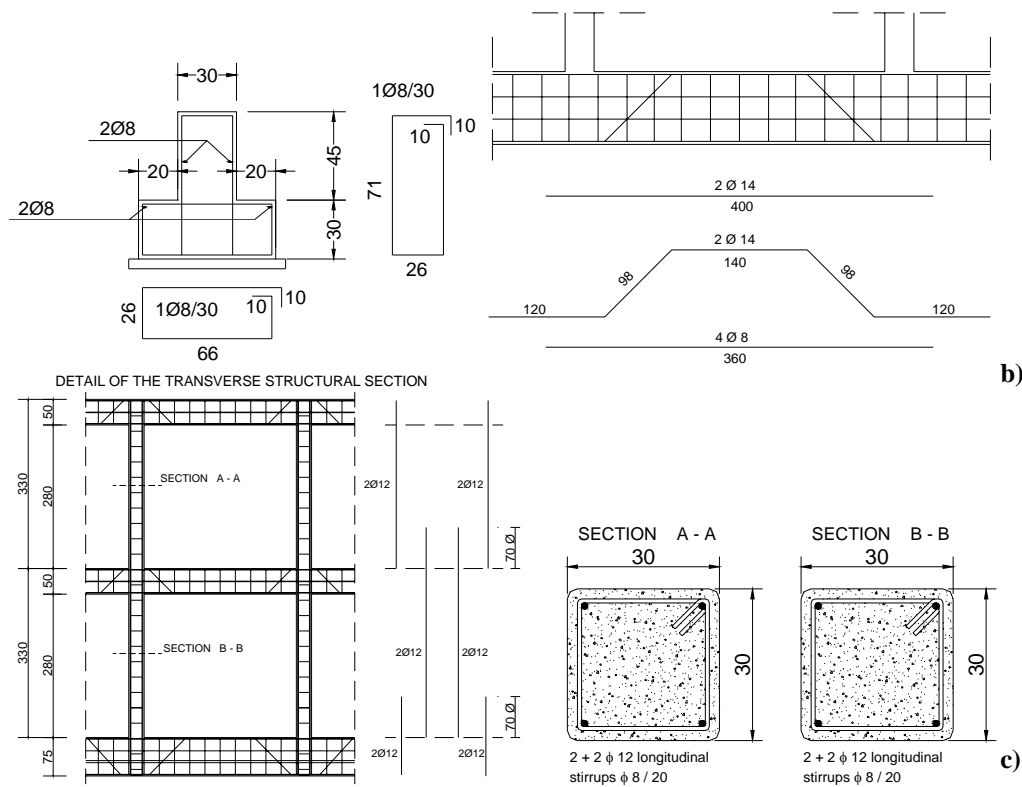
Steel reinforcement of beams (a), foundation beams (b) and columns (c)(length unit: cm)
